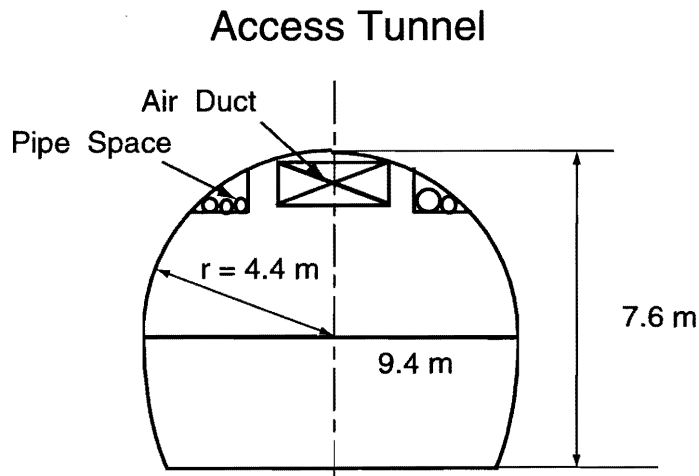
Cross section of the access tunnel to the main linac excavated by NATM.
